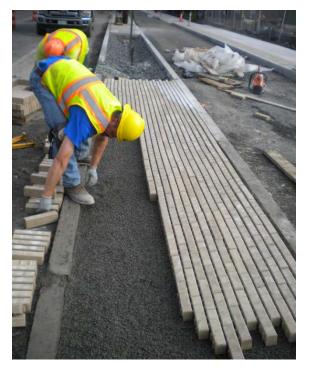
Pavers in Boardwalk Pattern Permeable pavers being installed
